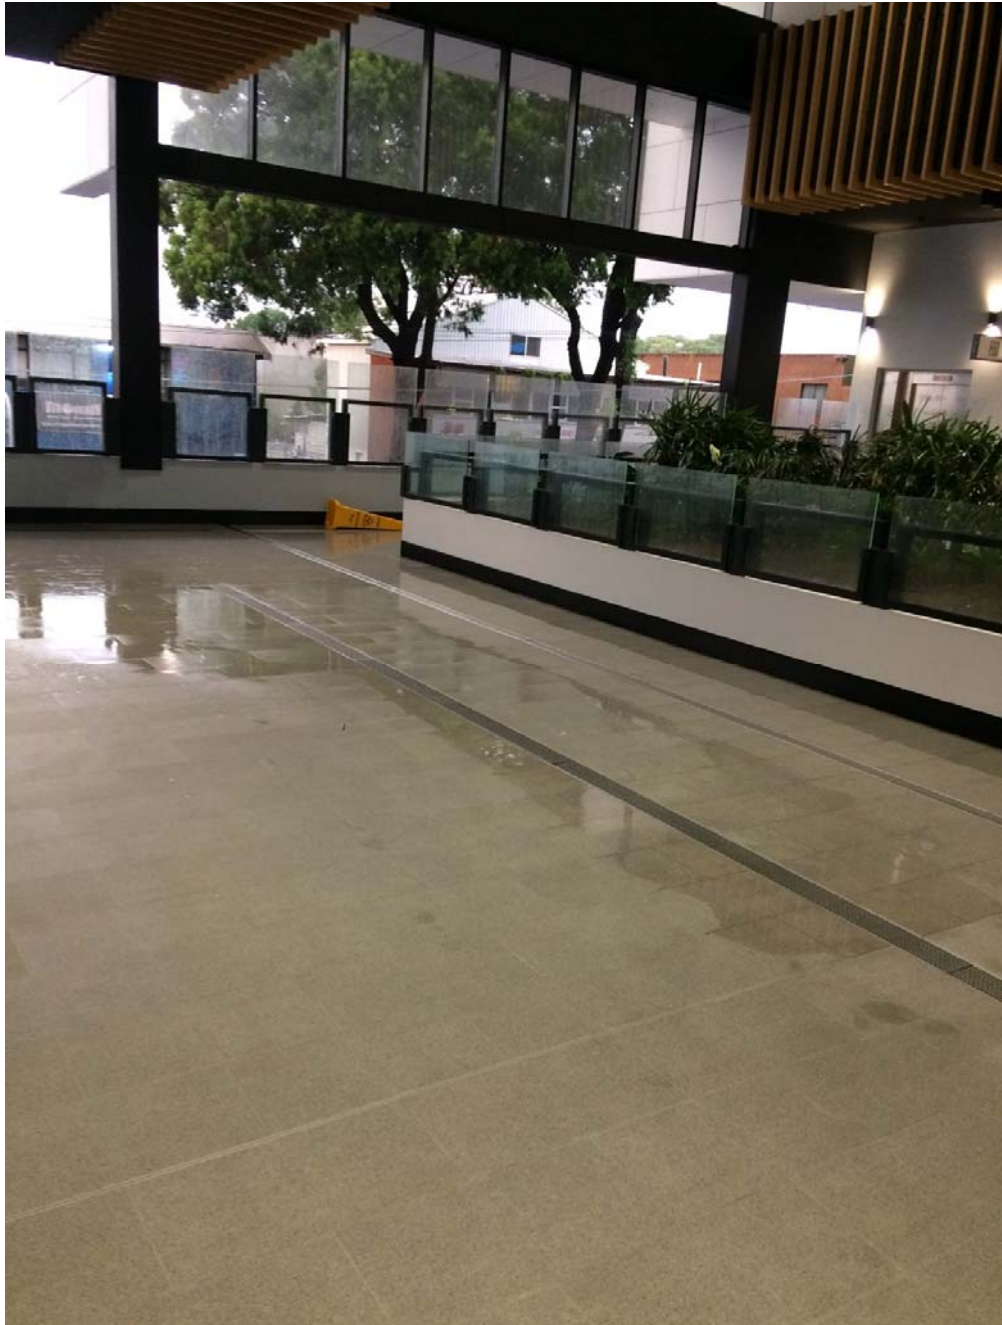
Photograph of South Village Shopping Centre: Mall area adjoining south elevation showing water penetration
